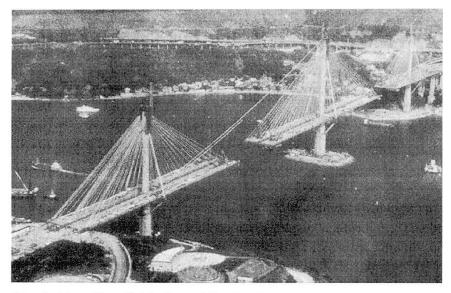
Ting Kau Cable Stayed Bridge Erection
